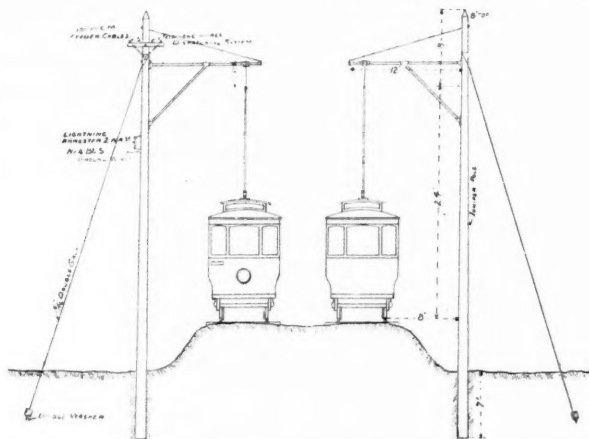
CROSS-SECTION OF CATENARY CONSTRUCTION ON WEST SHORE RAILROAD.
